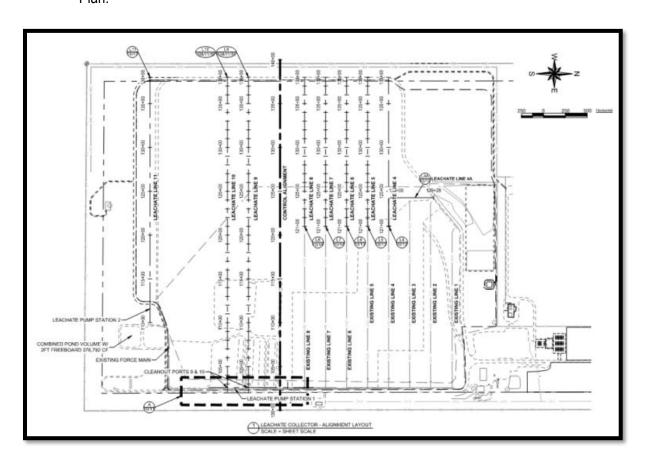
shows the leachate collection system as proposed to IDEQ in the Tentative Design Plan.
